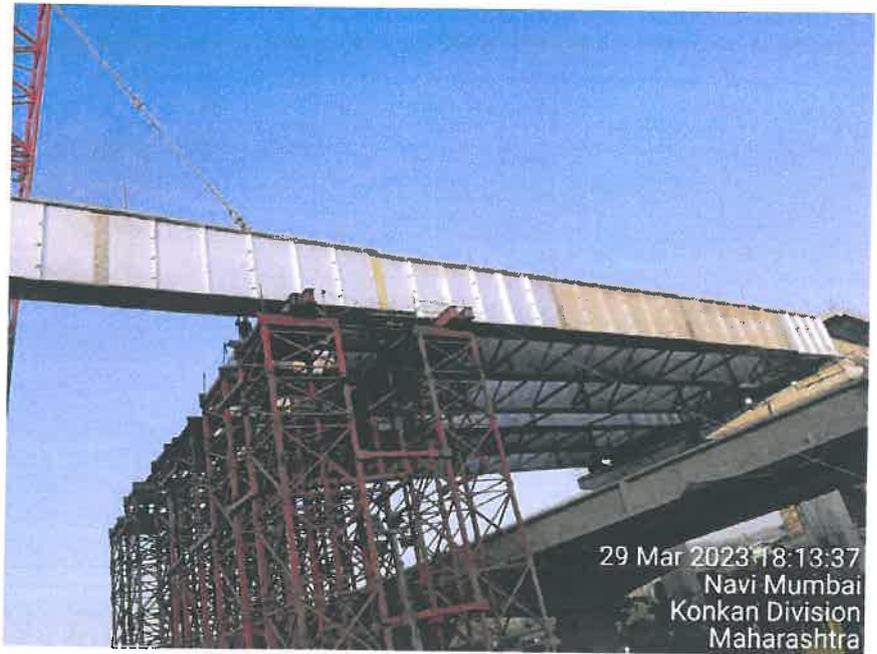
Steel girder erection work at Jasai SH-54 span RP 19-20.
